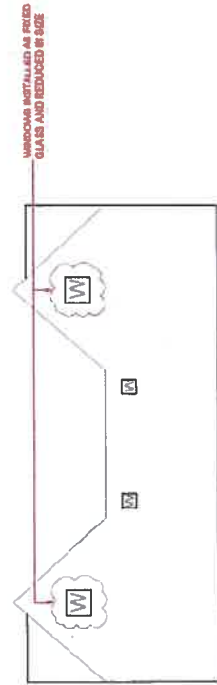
UNIT BLOCK B - EAST ELEVATION
